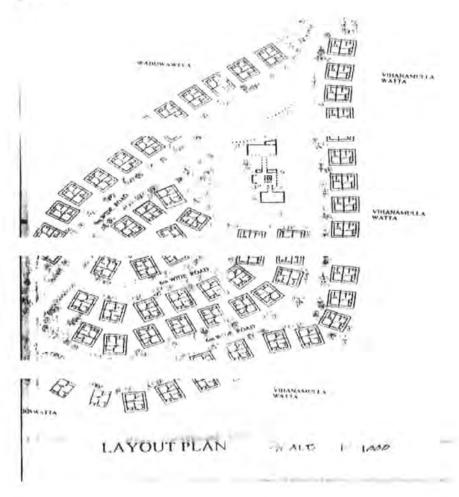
Layout plan of Damniyamgama (Unpublished document)
